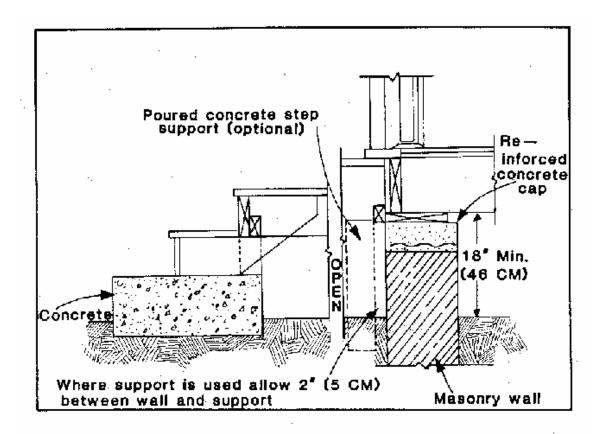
Construction of Wooden, Steps to Prevent Hidden Termite Attack.
